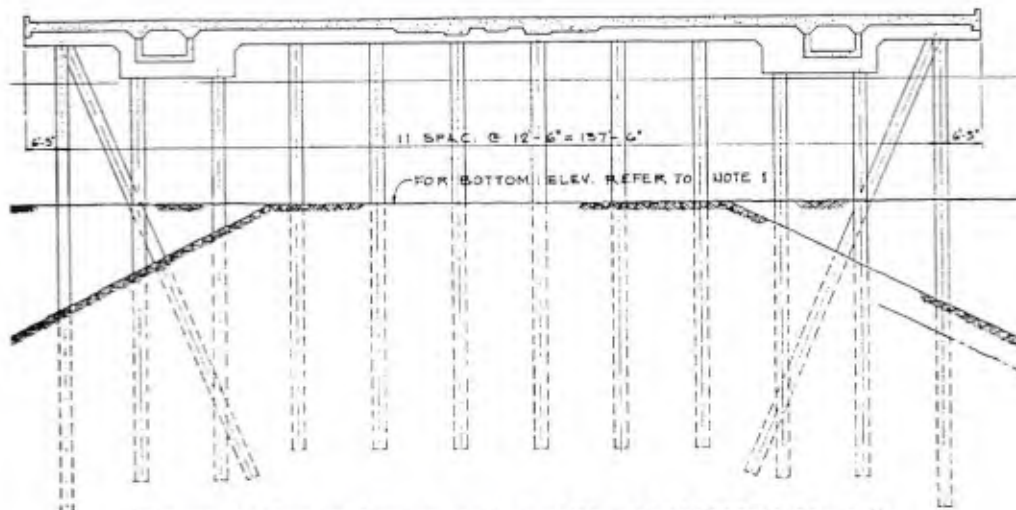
Nominal cross section of Pier 11 NAVSTA Norfolk.
